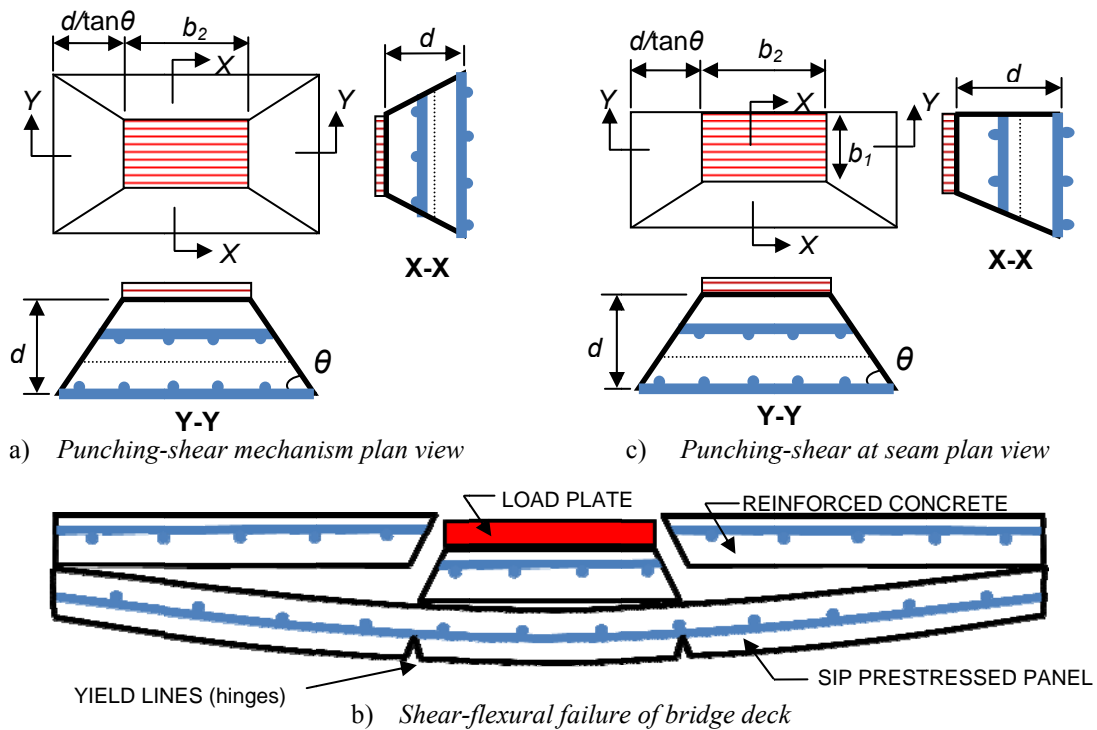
Shear-flexural failure and punching-shear failure of CIP-SIP bridge deck specimen
